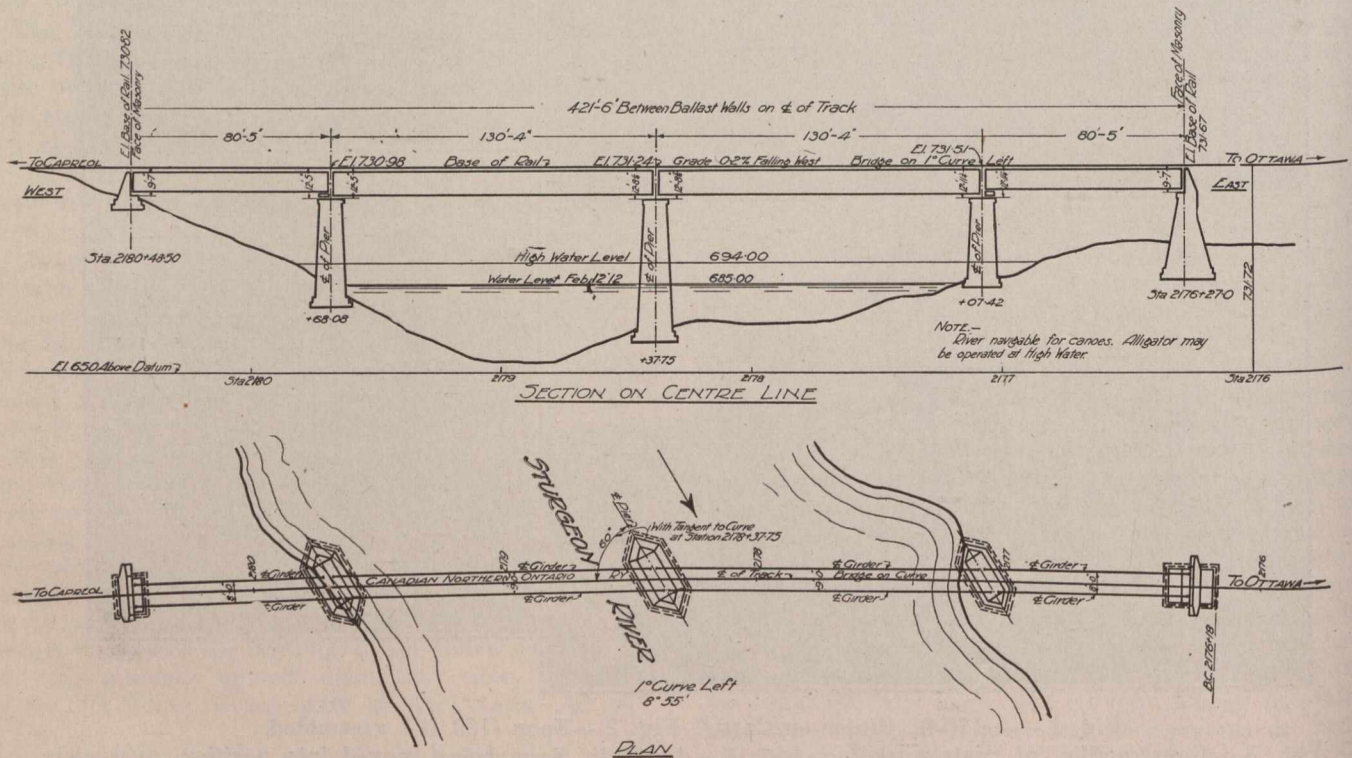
Plan and Elevation of Sturgeon River Bridge.
